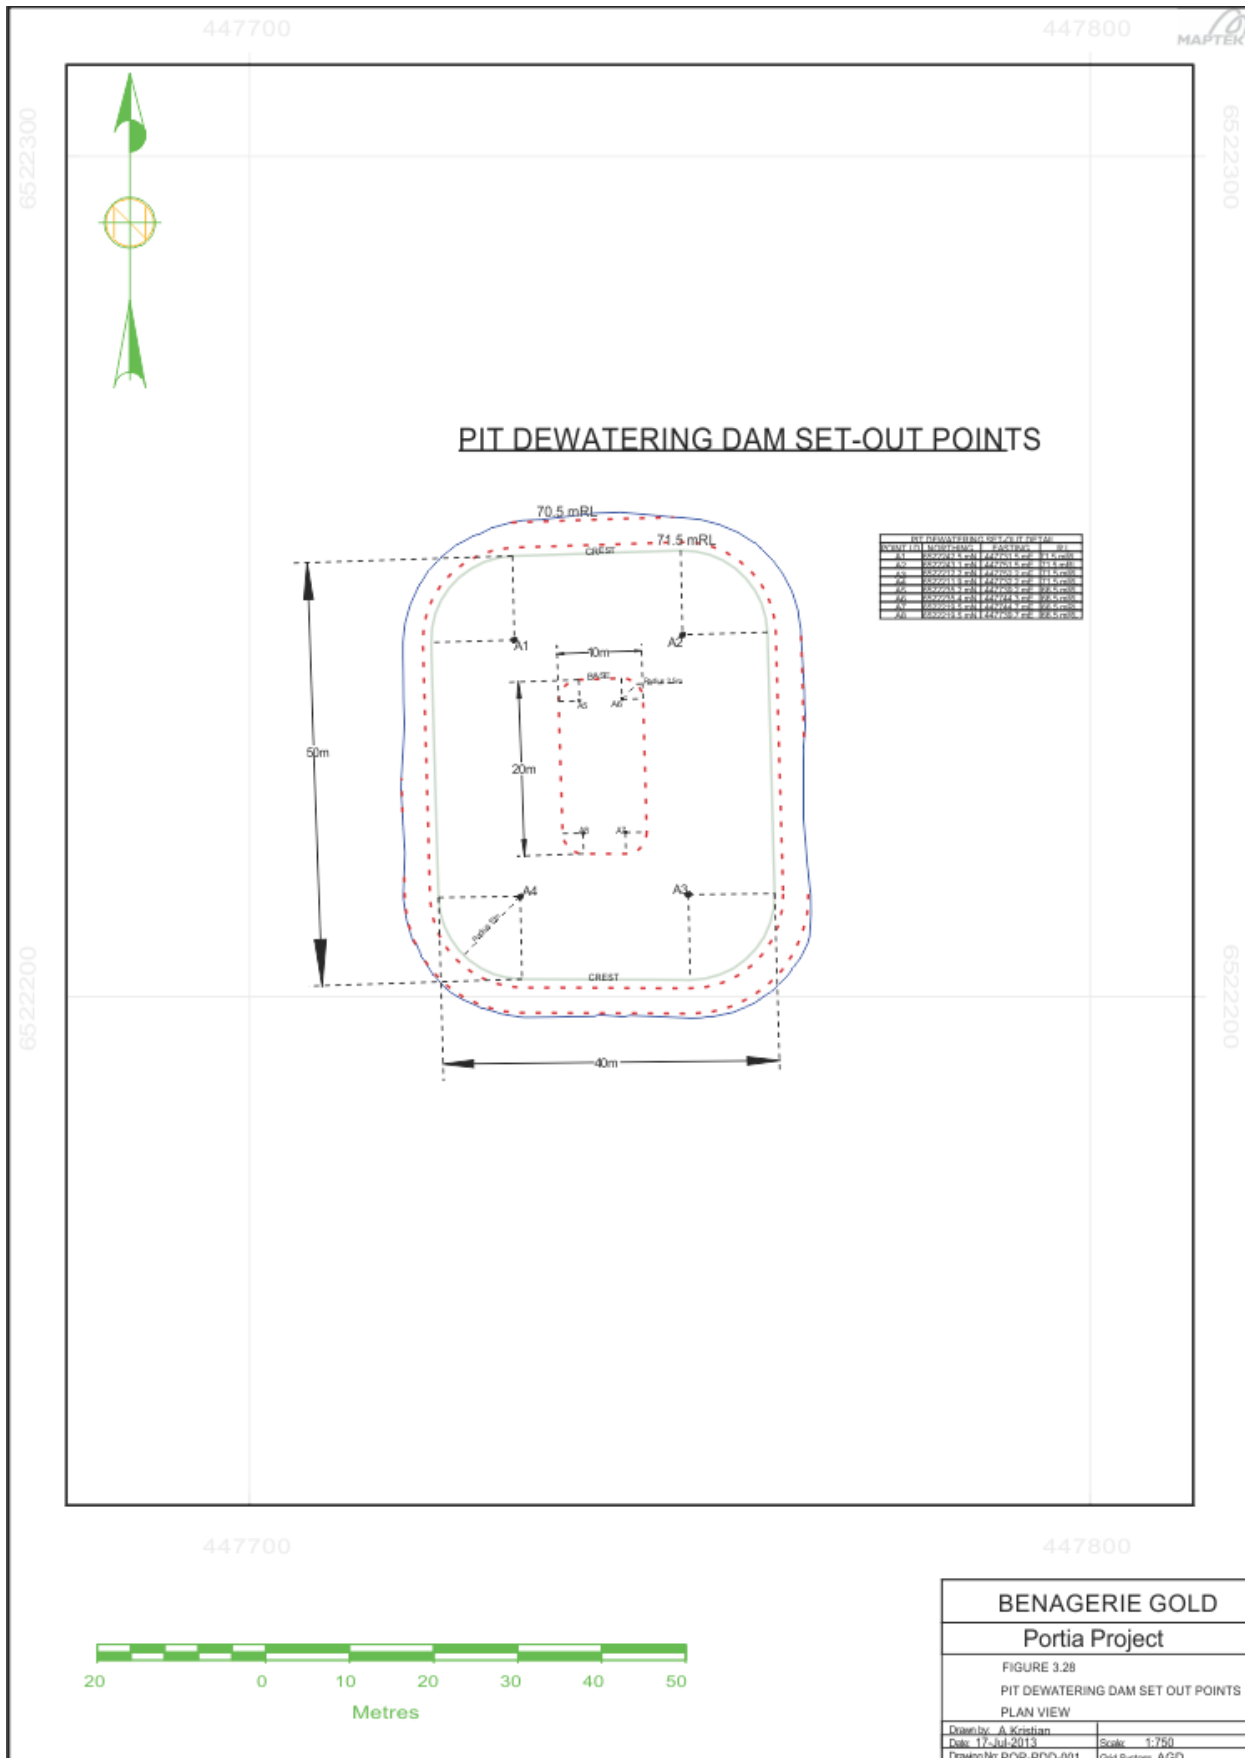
Plan View of the Pit Dewatering Dam (Design)
